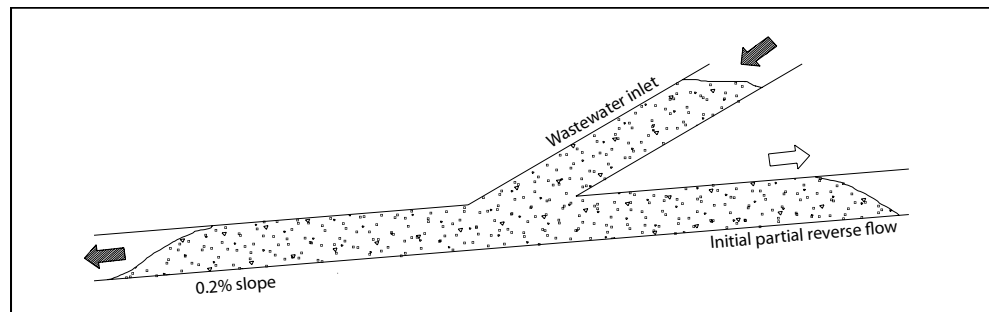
VACUUM SEWER SYSTEM PIPE LAYOUT DEPENDING ON TERRAIN SLOPE (SOURCE: VAB ANLAGENBAU)
